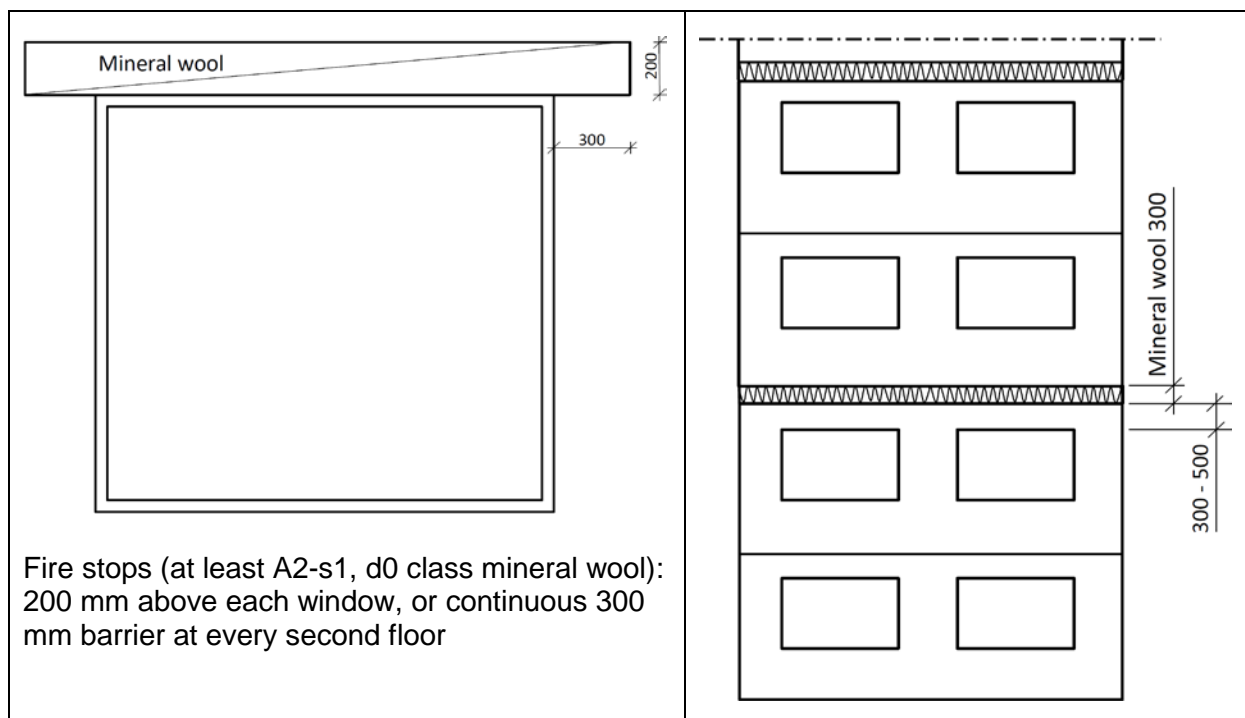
Examples of fire stop/barrier alternatives for buildings with more than two floors when EPS insulation is used in external walls [3].
